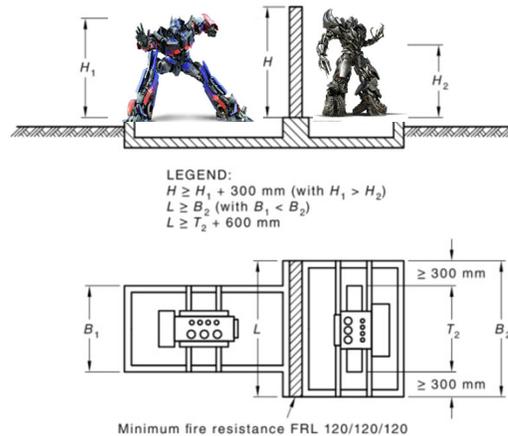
SEPARATING WALLS BETWEEN TRANSFORMERS
